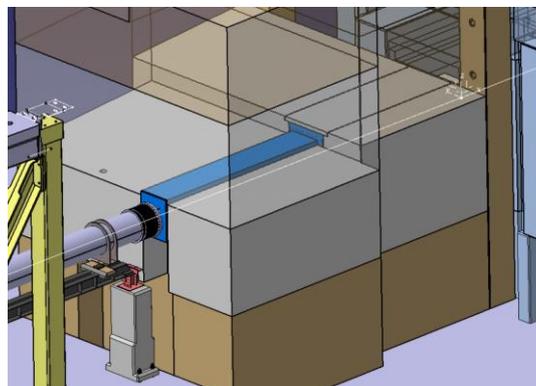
Section of the Bunker showing the location of the Bunker Wall Insert.
